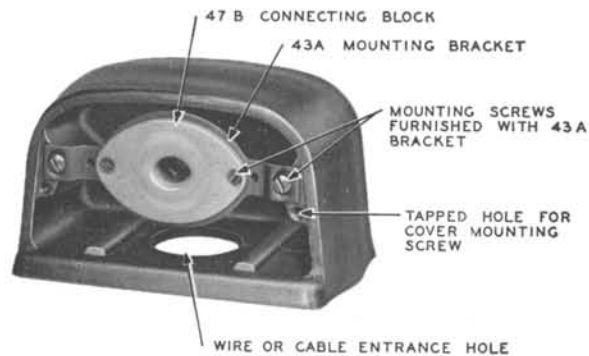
EXAMPLE A—47B CONNECTING BLOCK MOUNTED IN FITTINGS OF UNDERFLOOR DUCT SYSTEM
